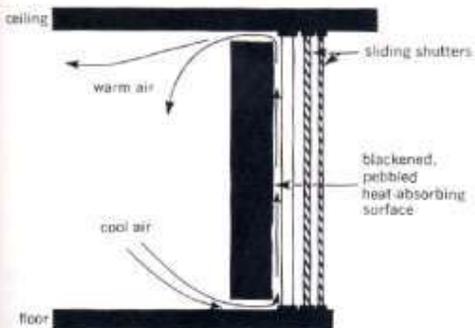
A south-facing, vertical solar collector and heat storage wall.
